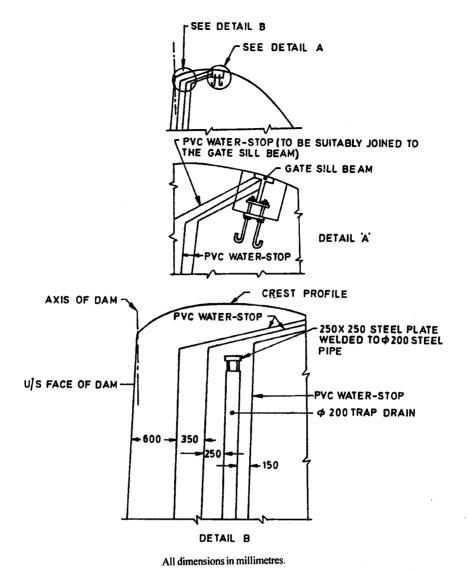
Typical Water-Stop Details Near the Crest of Gated Overflow Section
